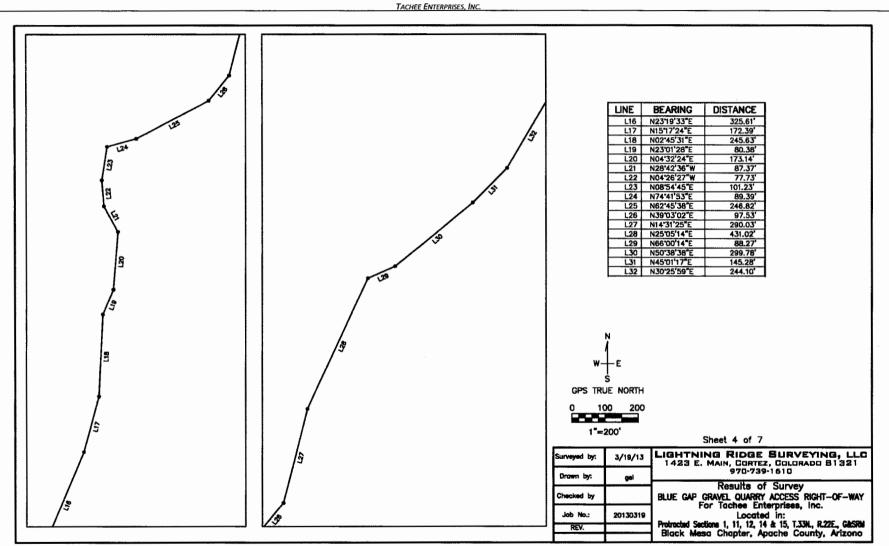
Proposed Access Road ROW plat (Page 3 of 6).
